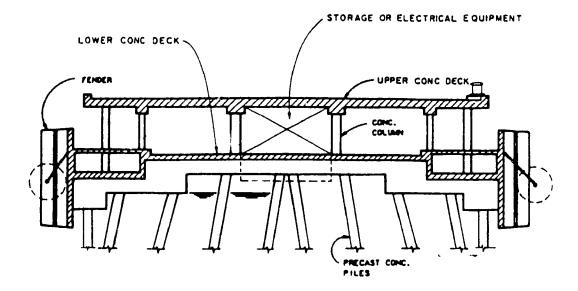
TWO-STORY CONCRETE PIER<sup>14</sup>
